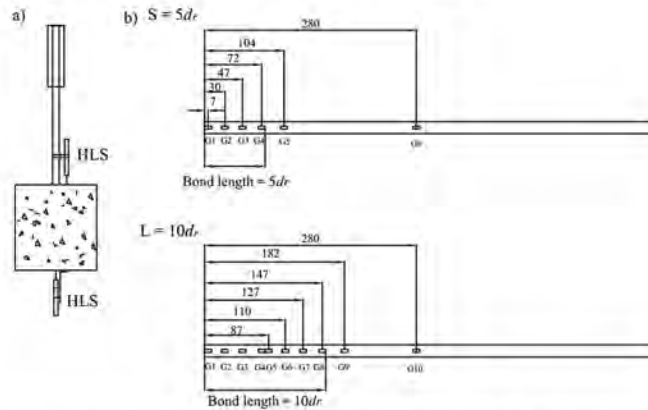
a) External instrumentation of the pull-out specimens b) Internal instrumentation of the GFRP reinforcing bar (distance in mm).
